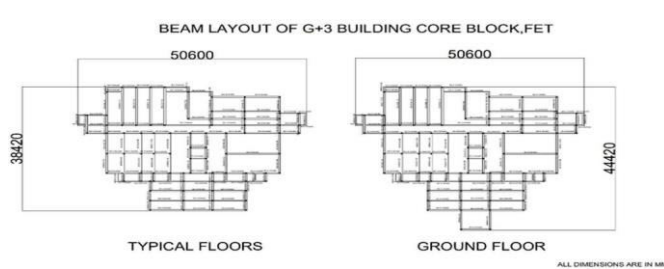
BEAM LAYOUT OF THE STRUCTURE
